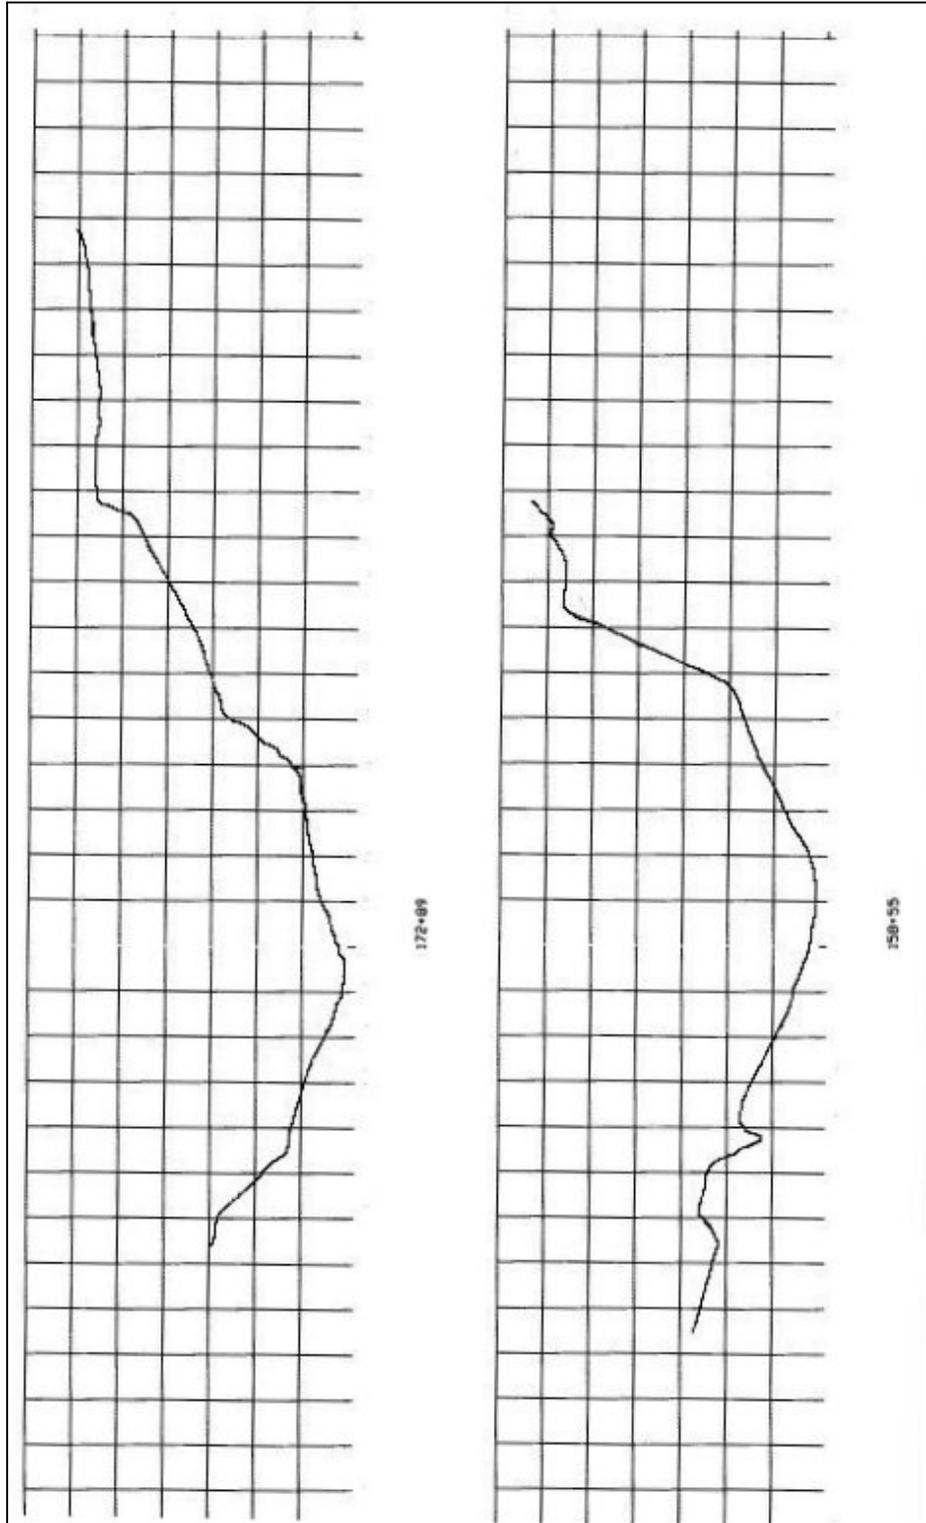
Sabine Neches Canal Cross-Sections
